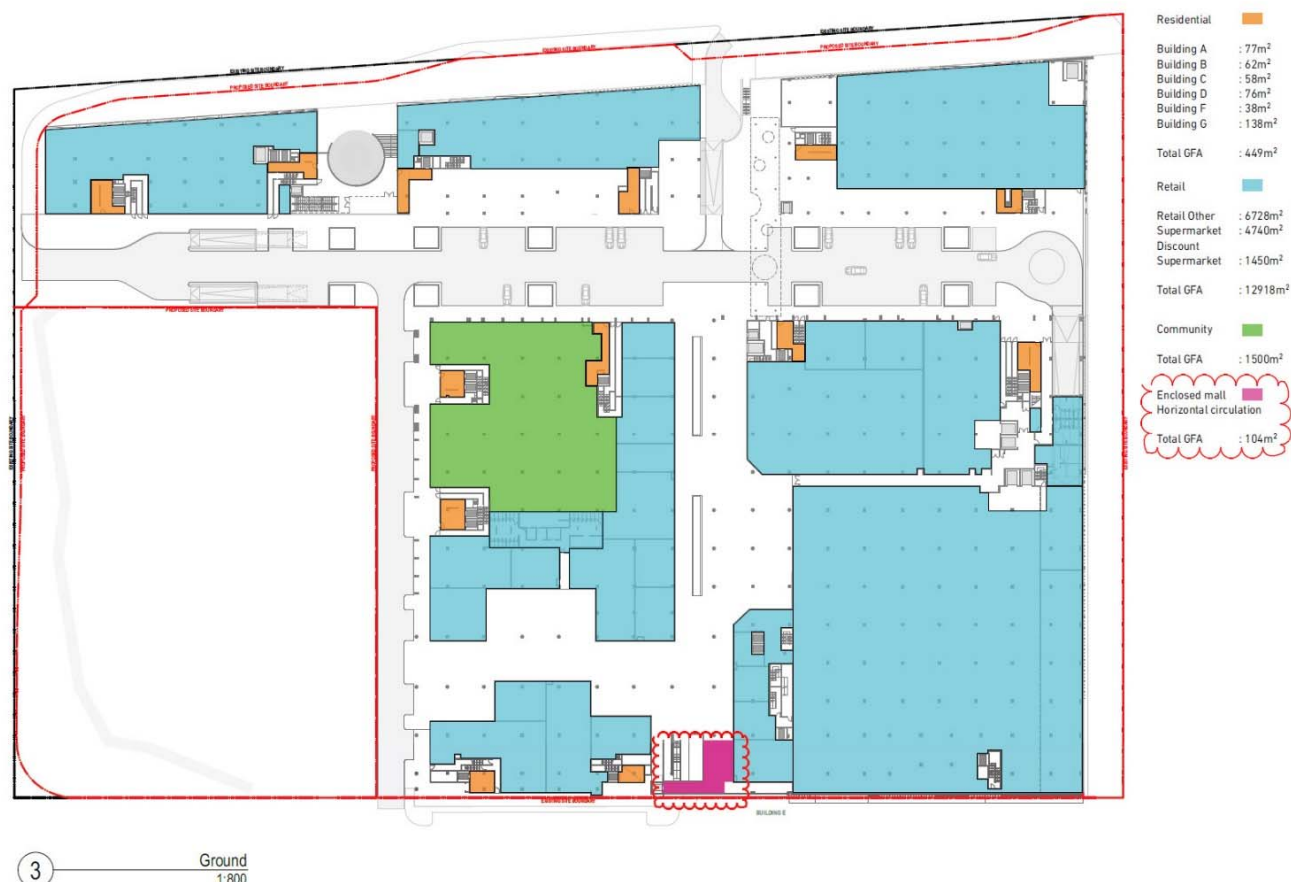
Modified GFA Diagrams: Ground Floor (Source: Turner)
